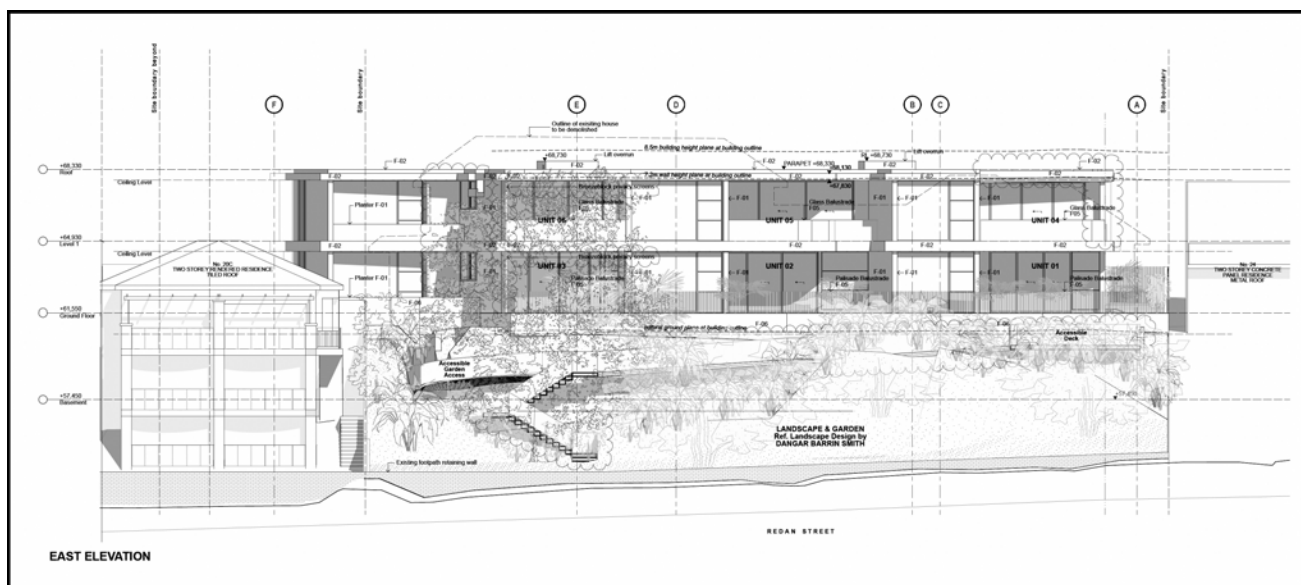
Eastern Elevation of the new proposal – from Fox Johnston Architects
